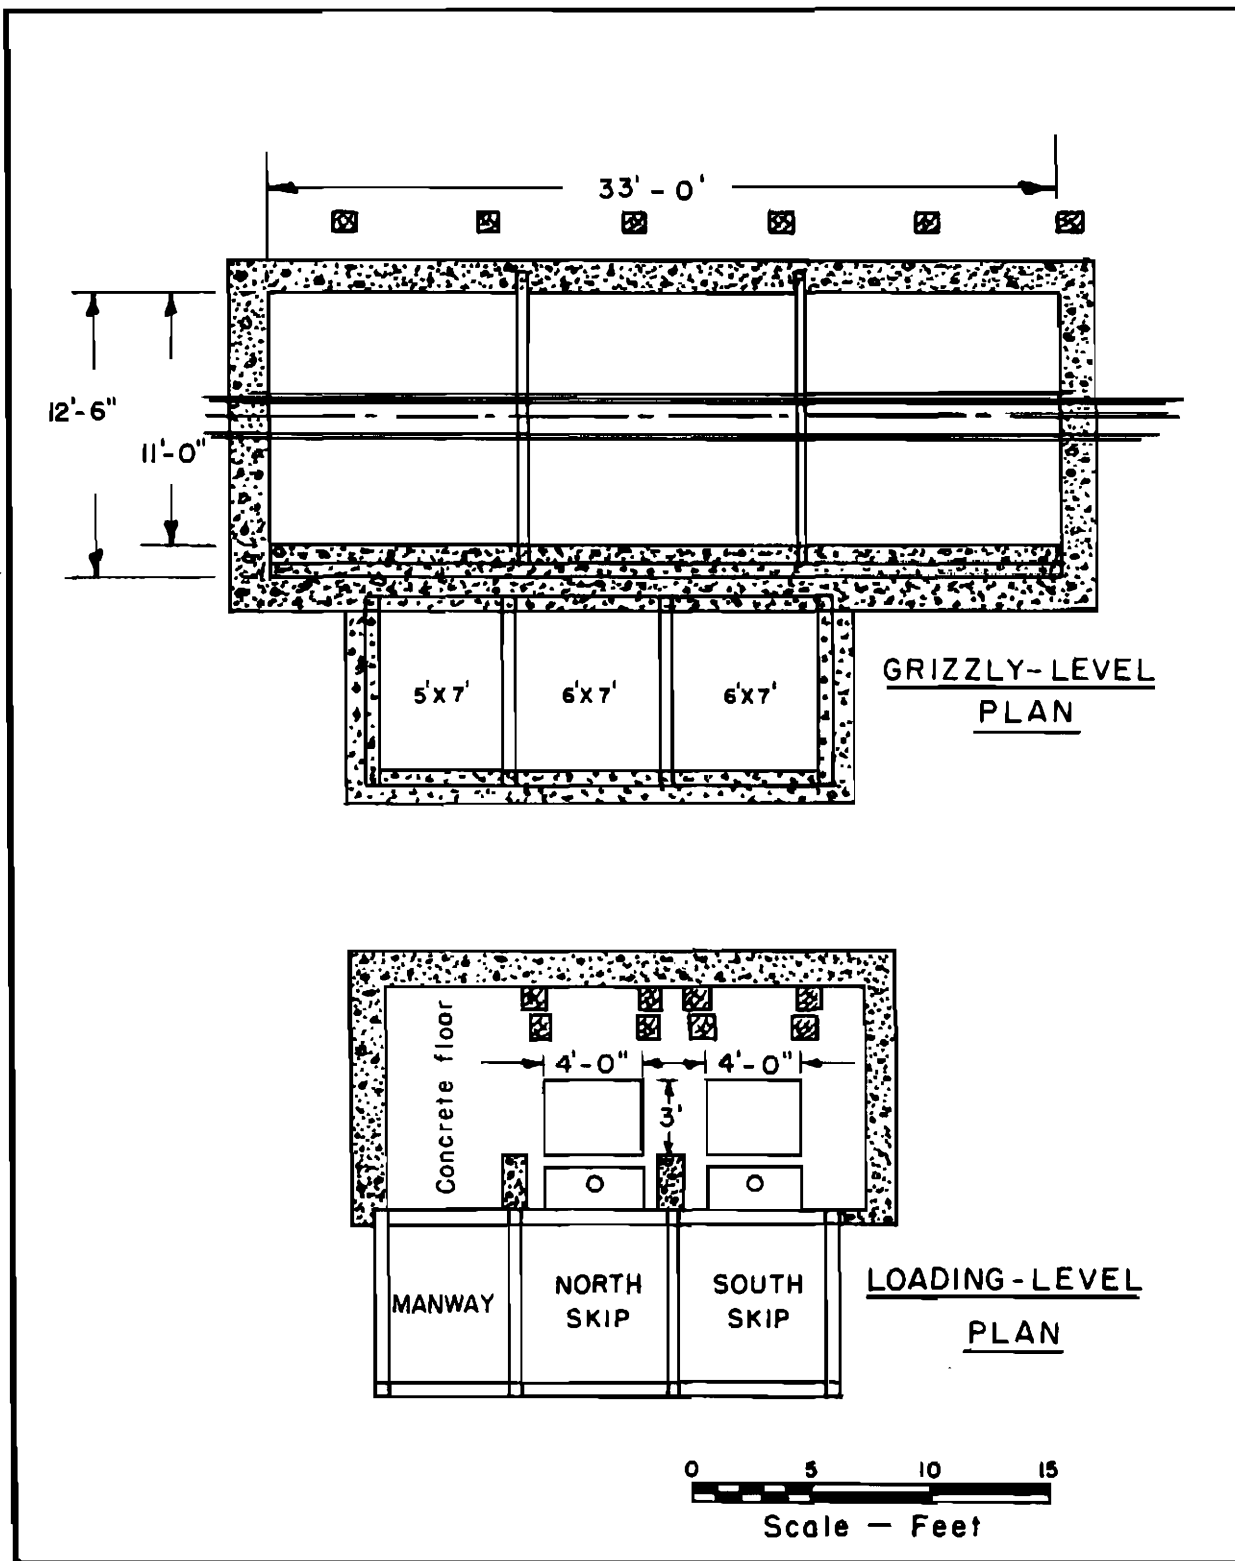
Ideal Plan, No. 3 Shaft.
